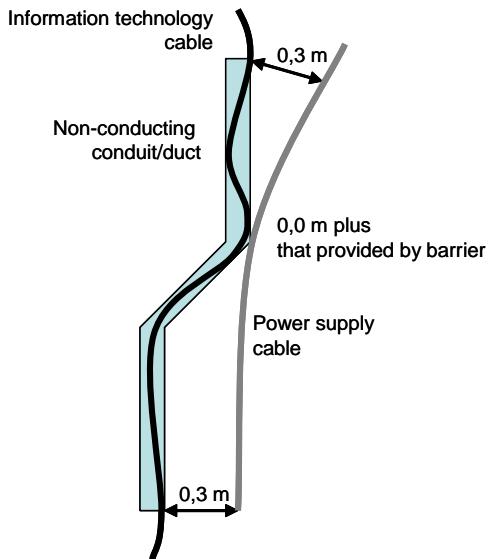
Example showing the protection of underground information technology cables when located next to power supply cables
